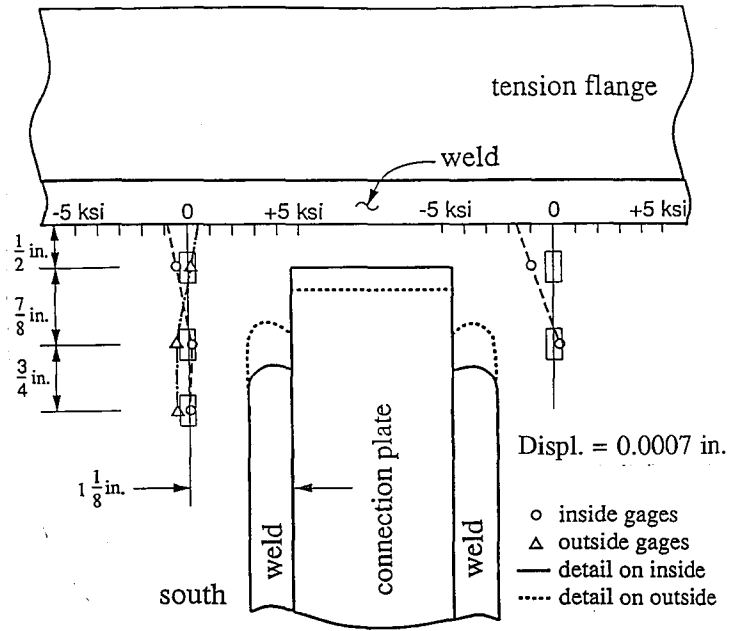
Static Stress Distribution on Outside Girder at Pier S7-9 (96 in. Girder) Before Retrofit with Lowboy in Outside Lane (Worst Case)
